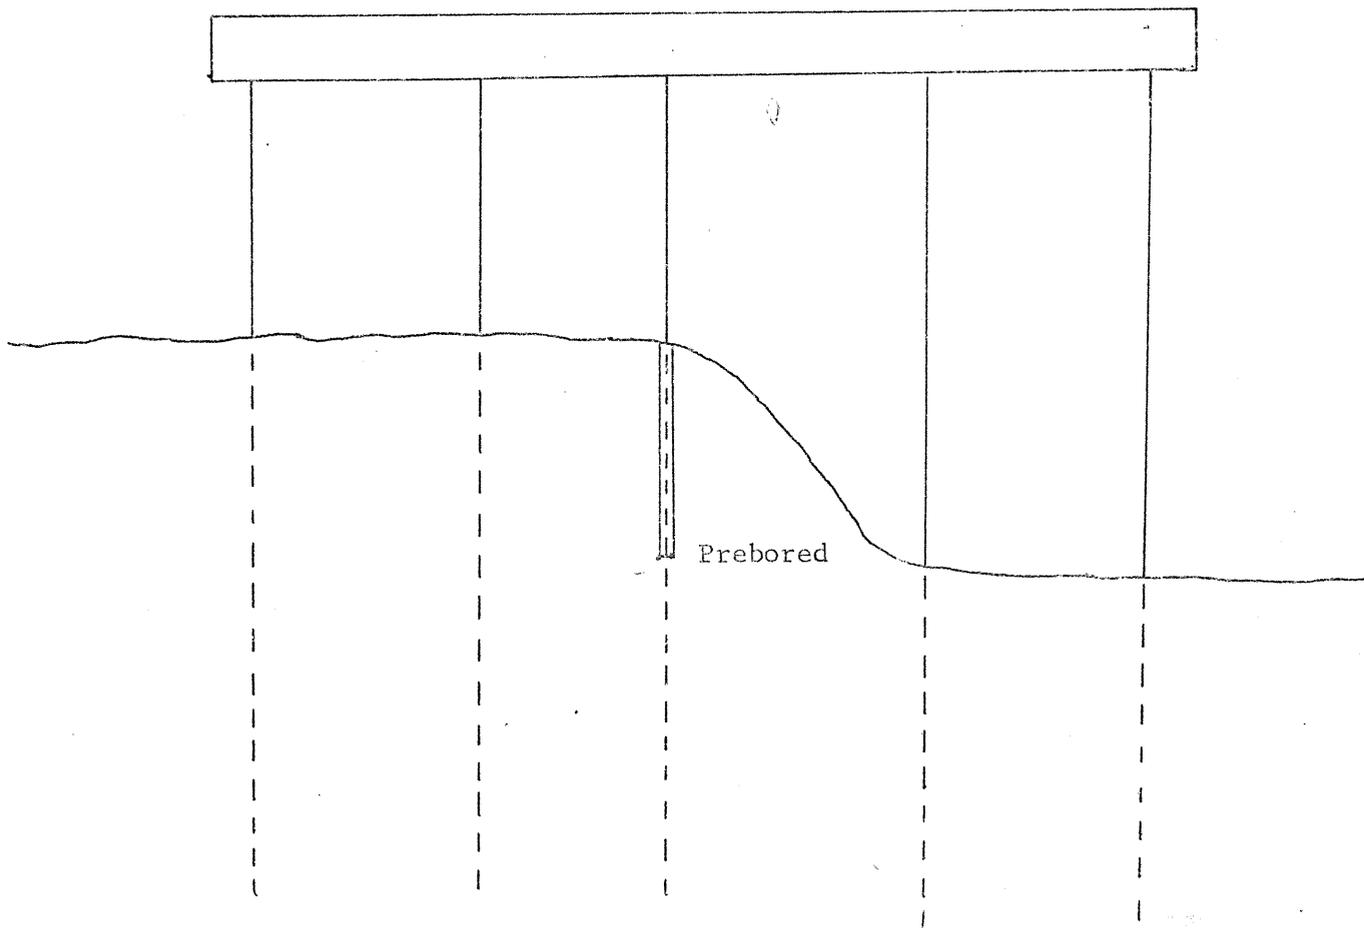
b. Pile Prebored to prevent Failure.
